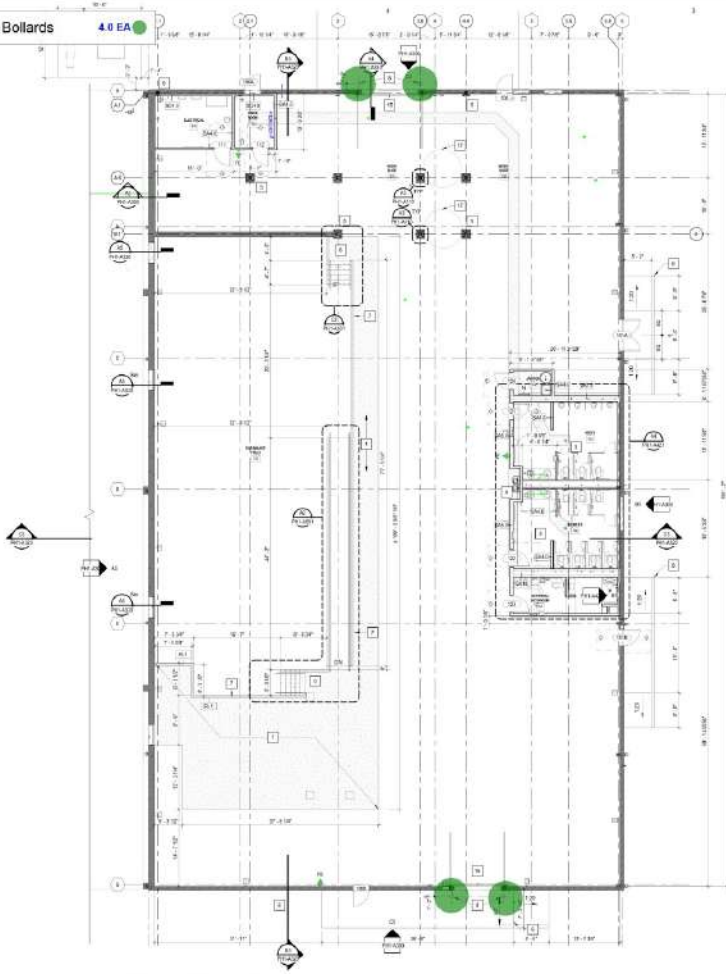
FLOOR PLAN - EXISTENTIAL/RE-USE
